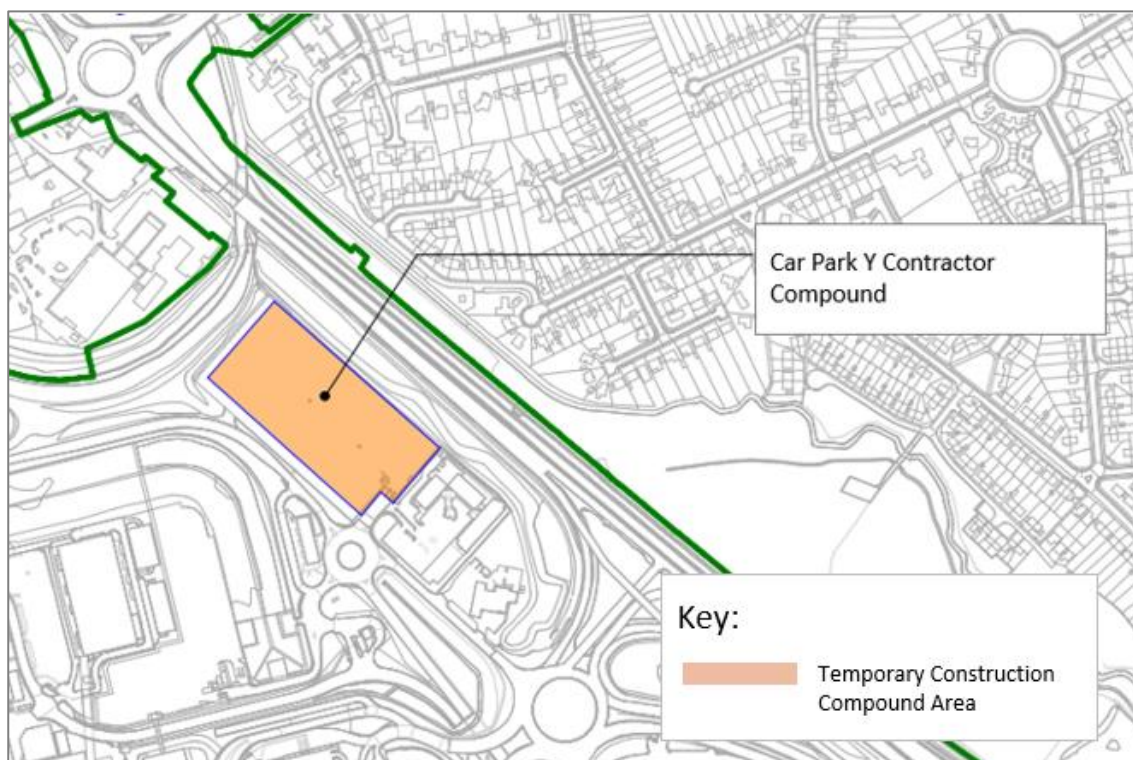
Site Context Plan - Car Park Y Reprocessing Area
